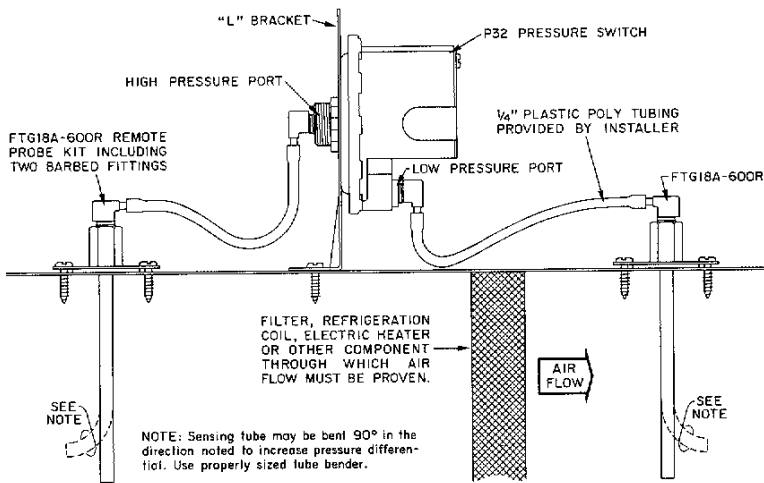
The P32 may be mounted on either a vertical or horizontal surface using an "L" bracket and two FTG18A-600R remote mounted probe kits.
